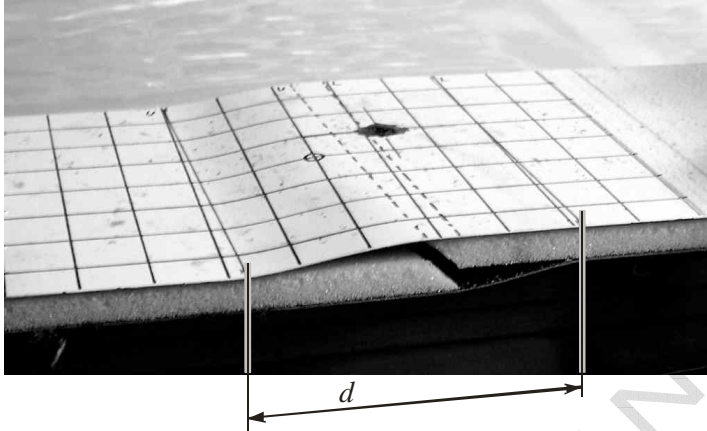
Fully developed sandwich panel shear failure with extensive debonding d between core and face-sheets.
